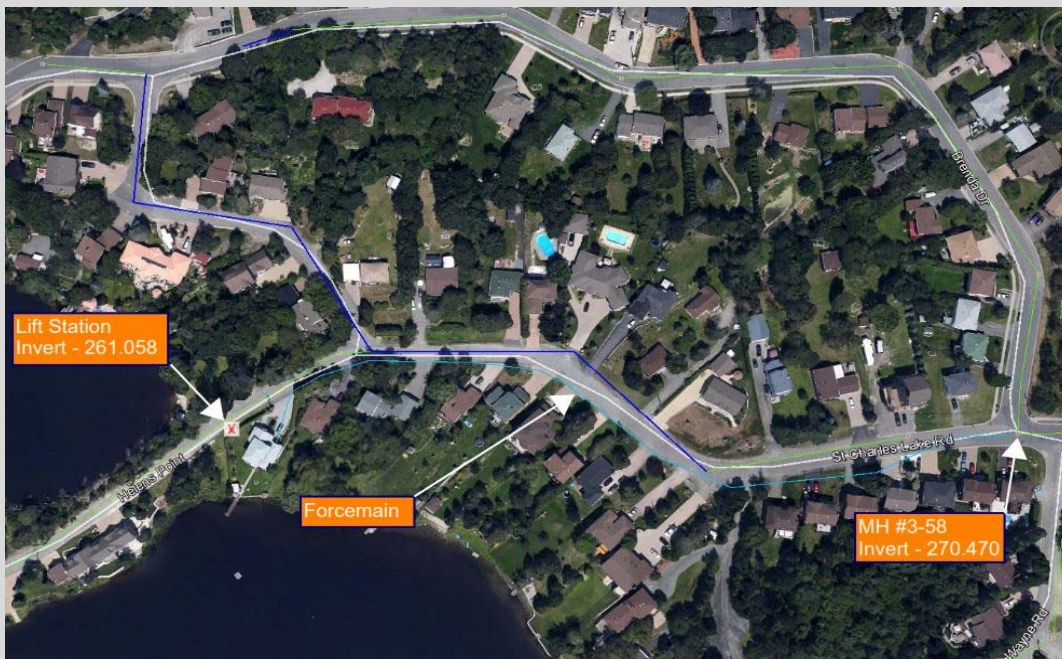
Manhole location, invert, and forcemain locations surrounding Helen's Point Pumping Station
